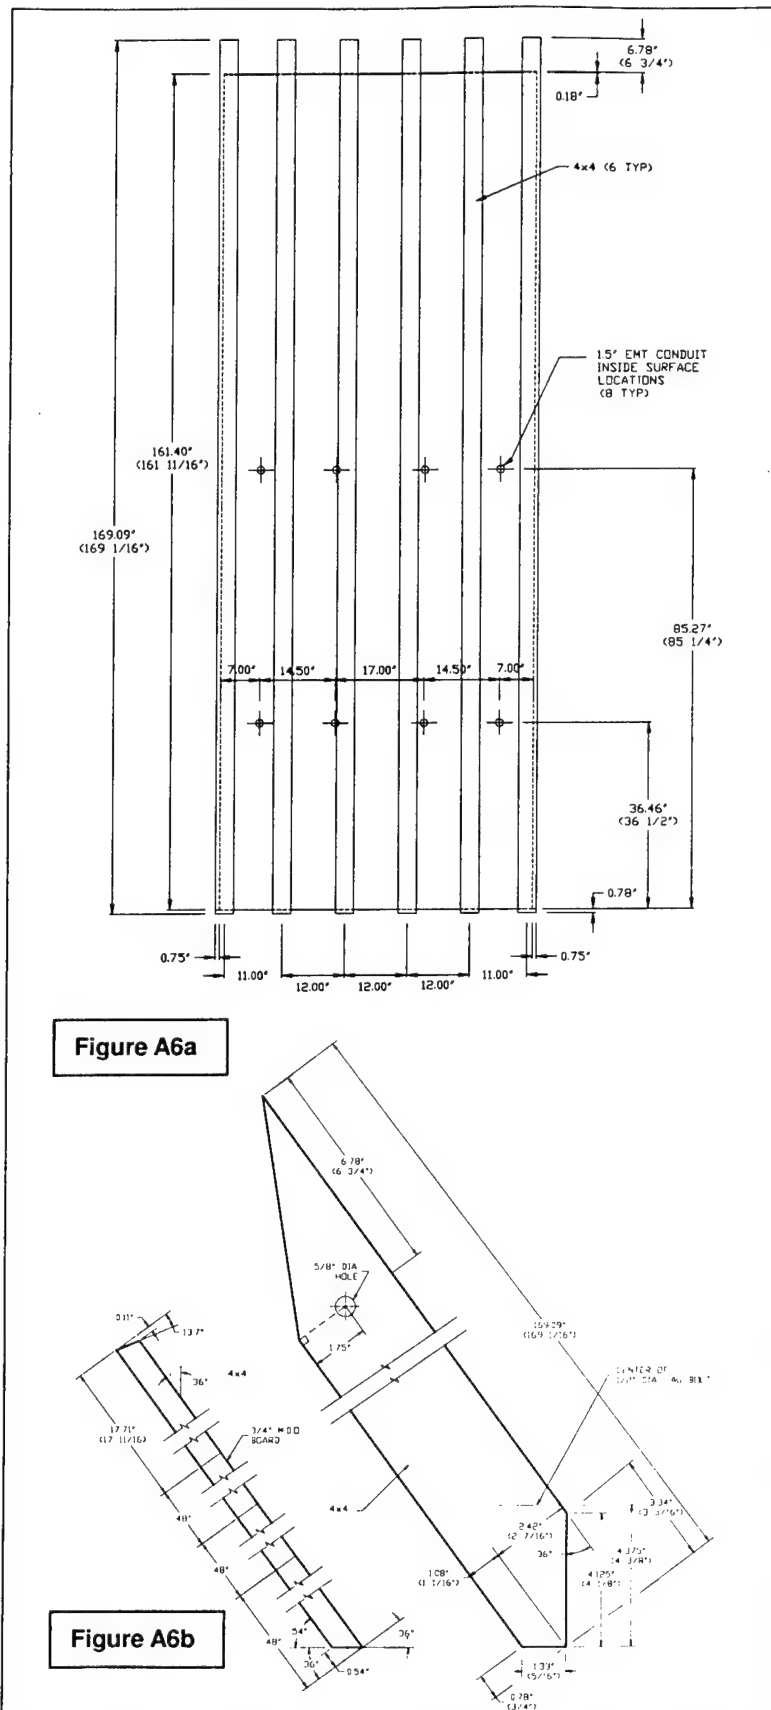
Lower downstream face drawing of dam model formwork (a) showing MDO board and ribs and (b) elevation view showing details of the MDO board, ribs, and bolt hole locations.
